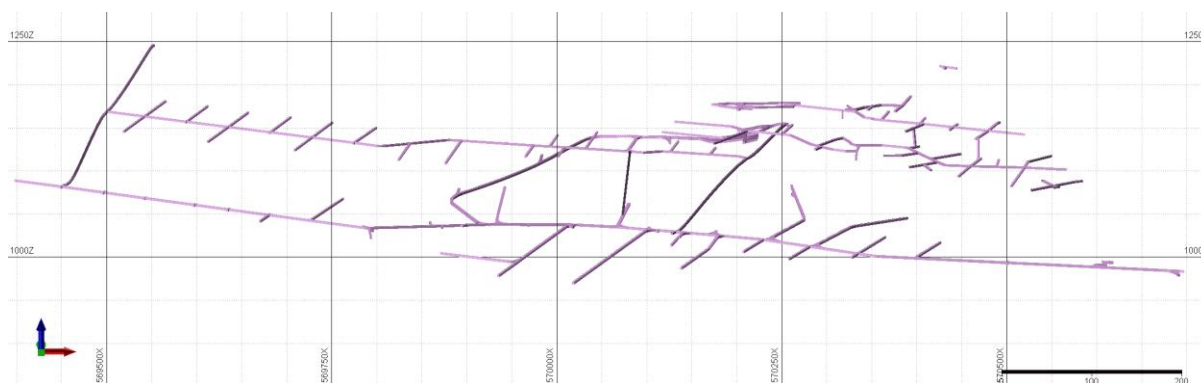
Novazza underground development (interpreted from old sections and plans), looking obliquely north (source: AMS, 2026).
